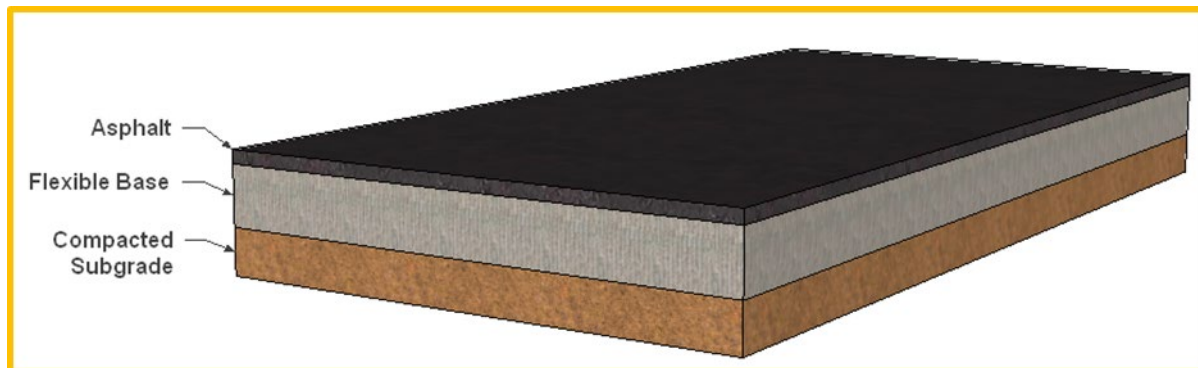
FLEXIBLE PAVEMENT TYPICAL SECTION
